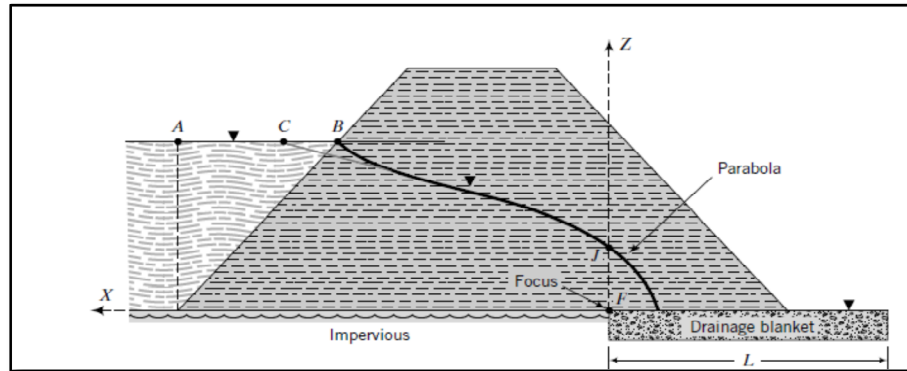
General Arrangement of Homogenous Earthen Embankment showing Phreatic Surface, with toe drain. (Picture courtesy - Soil Mechanics & Foundation Engineering 3rd edition 2010 , by Muni Budhu)
